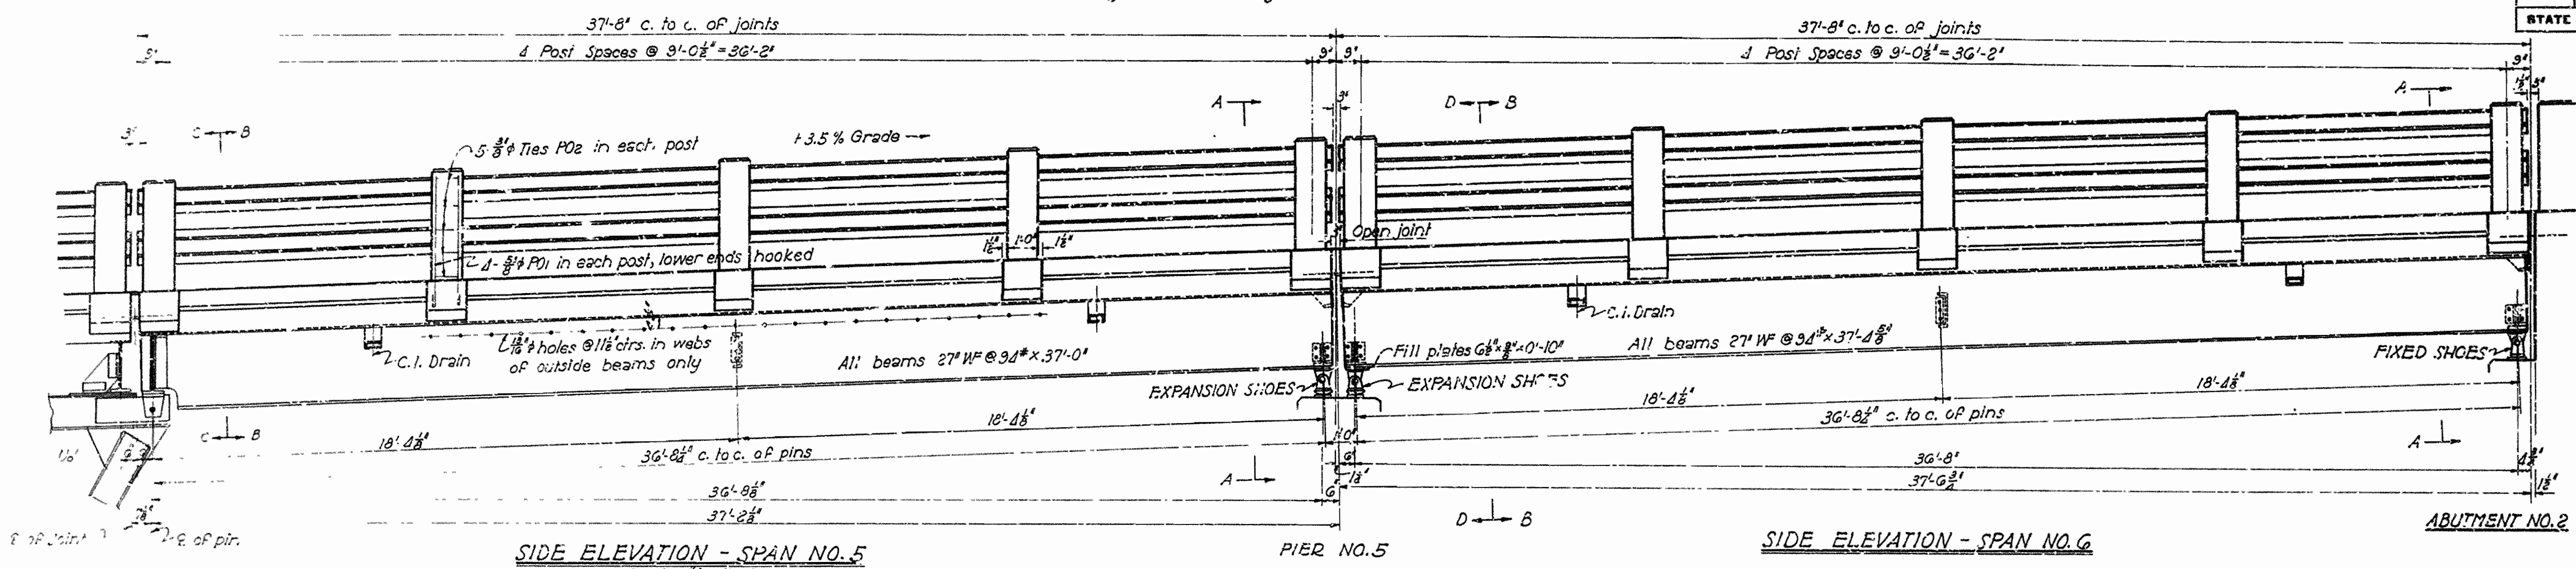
DETAILS OF HANDRAILS FOR DECK CANTILEVER TRUSS SPANS BRIDGE OVER CROOKED CREEK AND MISSOURI PACIFIC RAILROAD BELLFONTE - YELVILLE ROAD MARION COUNTY ROUTE 62 SEC. 8
